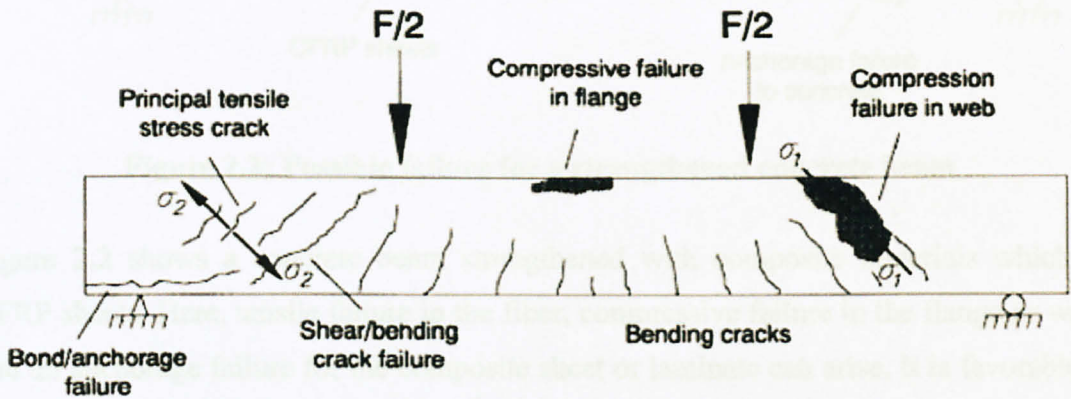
Possible failure for a simply supported rectangular concrete beam
